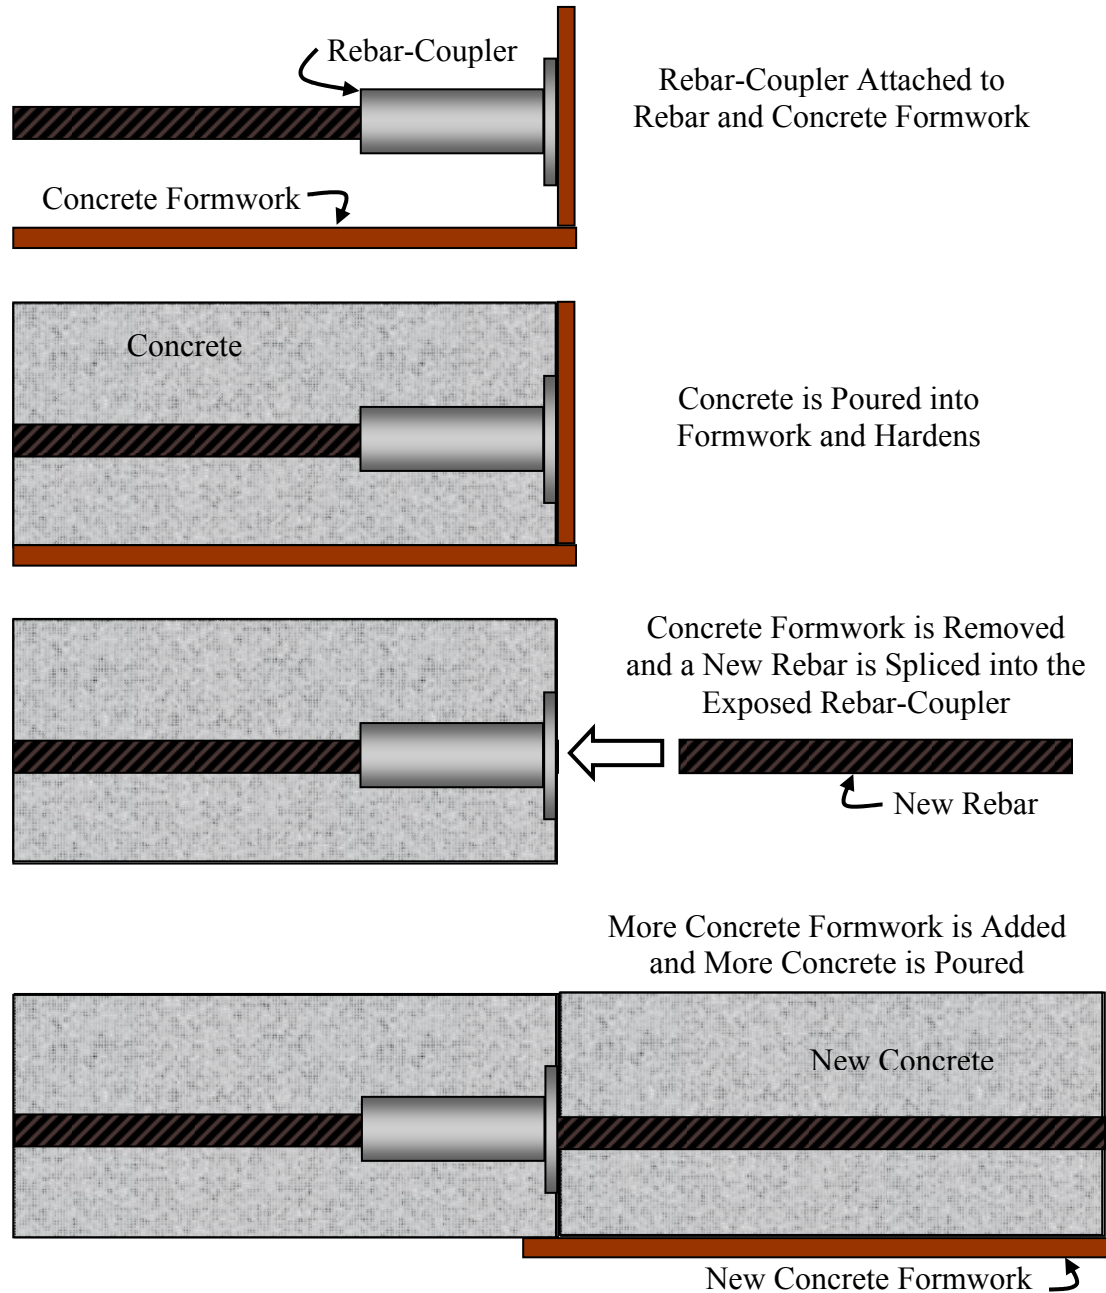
The construction sequence of a rebar-coupler creating continuity of reinforcing across a construction joint.
